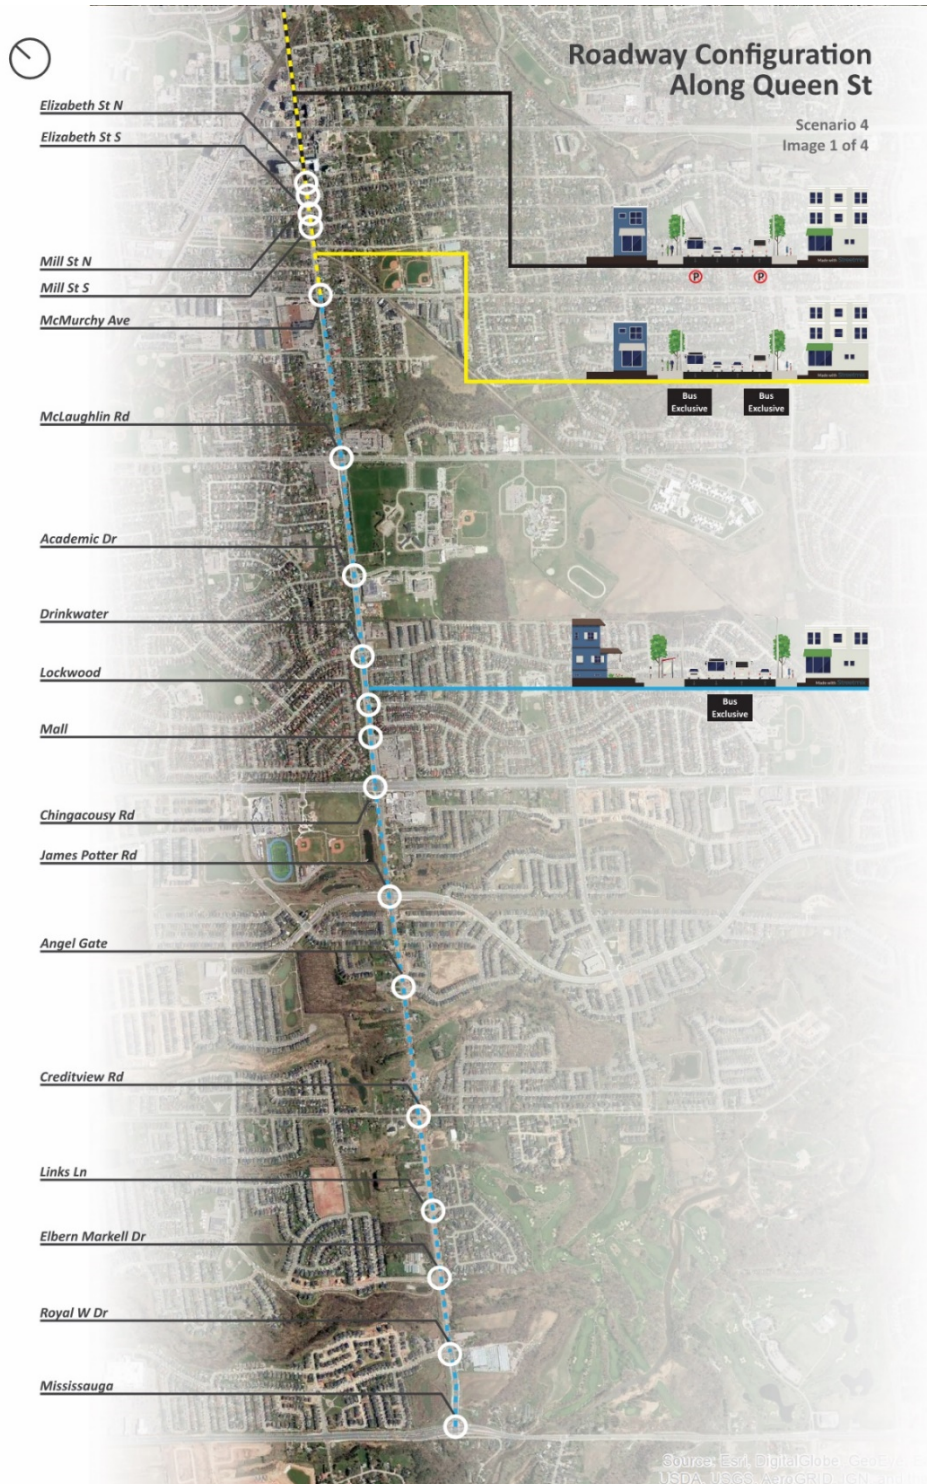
Scenario 4 road configuration, Mississauga Road to Mill Street North
